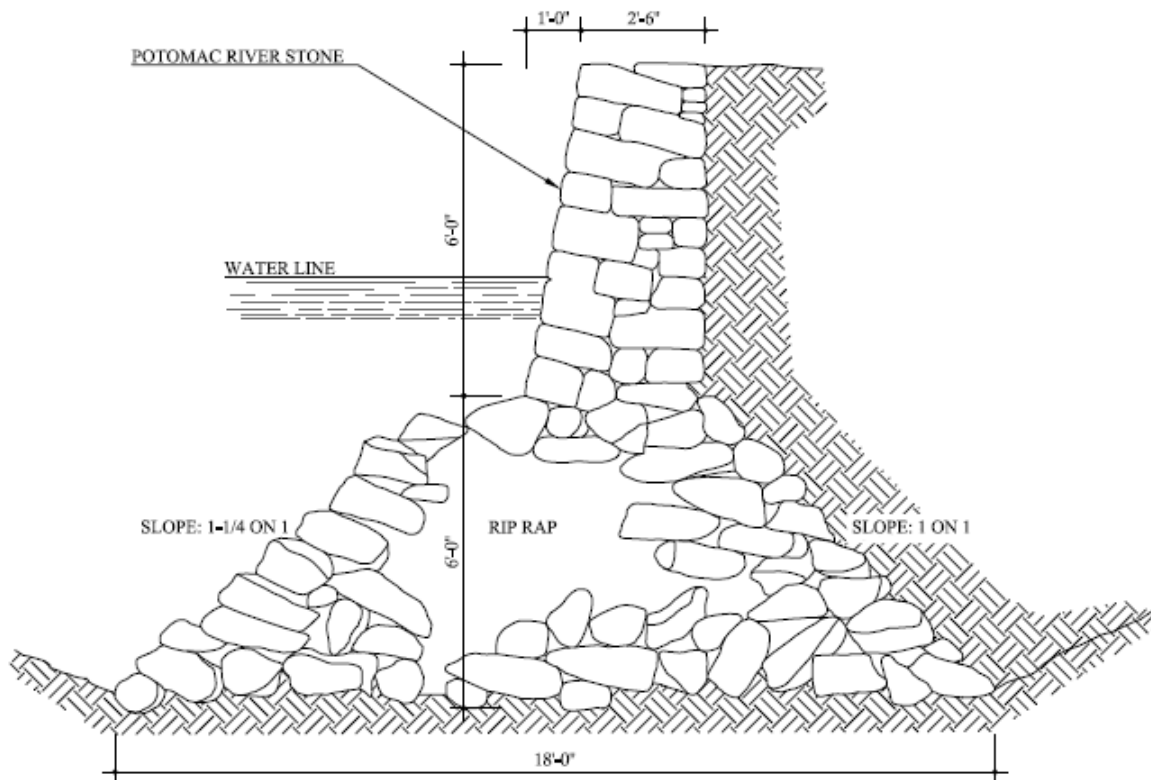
TYPICAL SEAWALL CROSS-SECTION (NPS, 2018).
